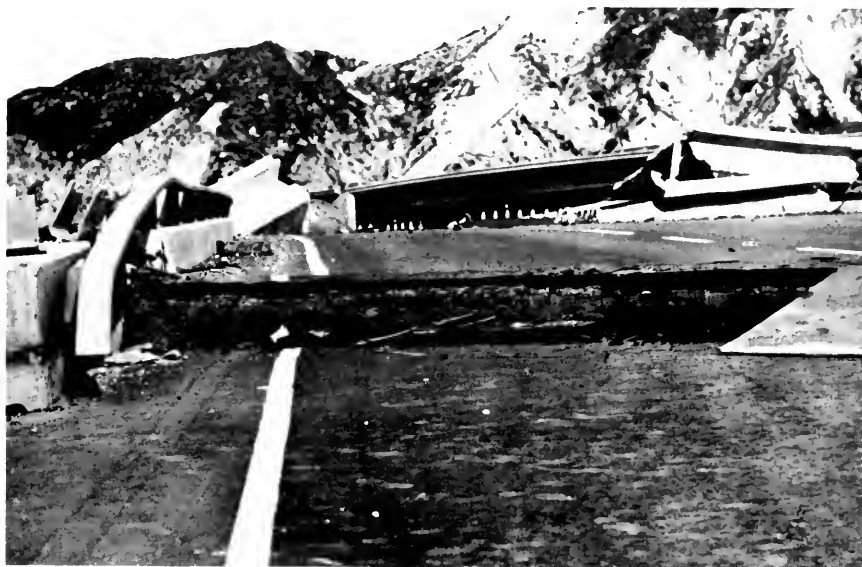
Settlement of backfill at the San Fernando Road overhead [2].
